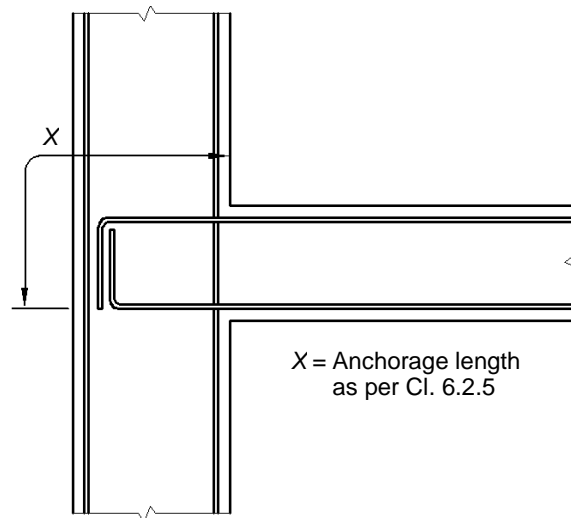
ANCHORAGE OF LONGITUDINAL BEAM BARS AT EXTERIOR BEAM-COLUMN JOINT
